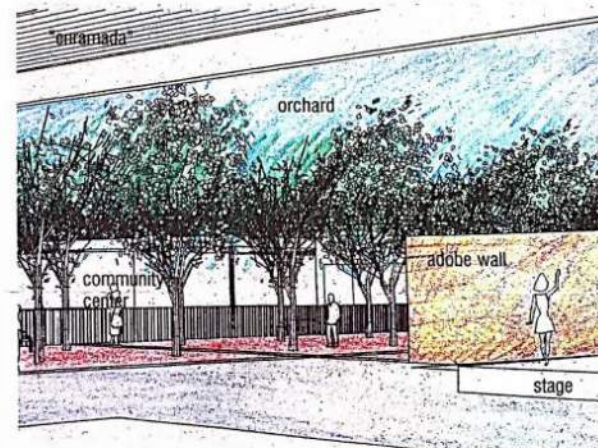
View of Stage and Adobe Wall from under "Enramada"
